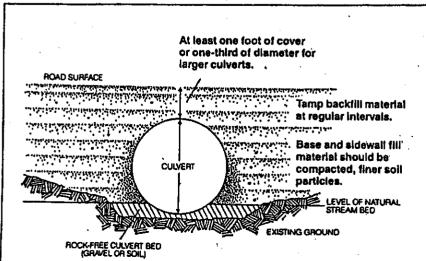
Rock-free fill is backfilled over the culvert in layers and compacted under the pipe and around the sidewall (E).
